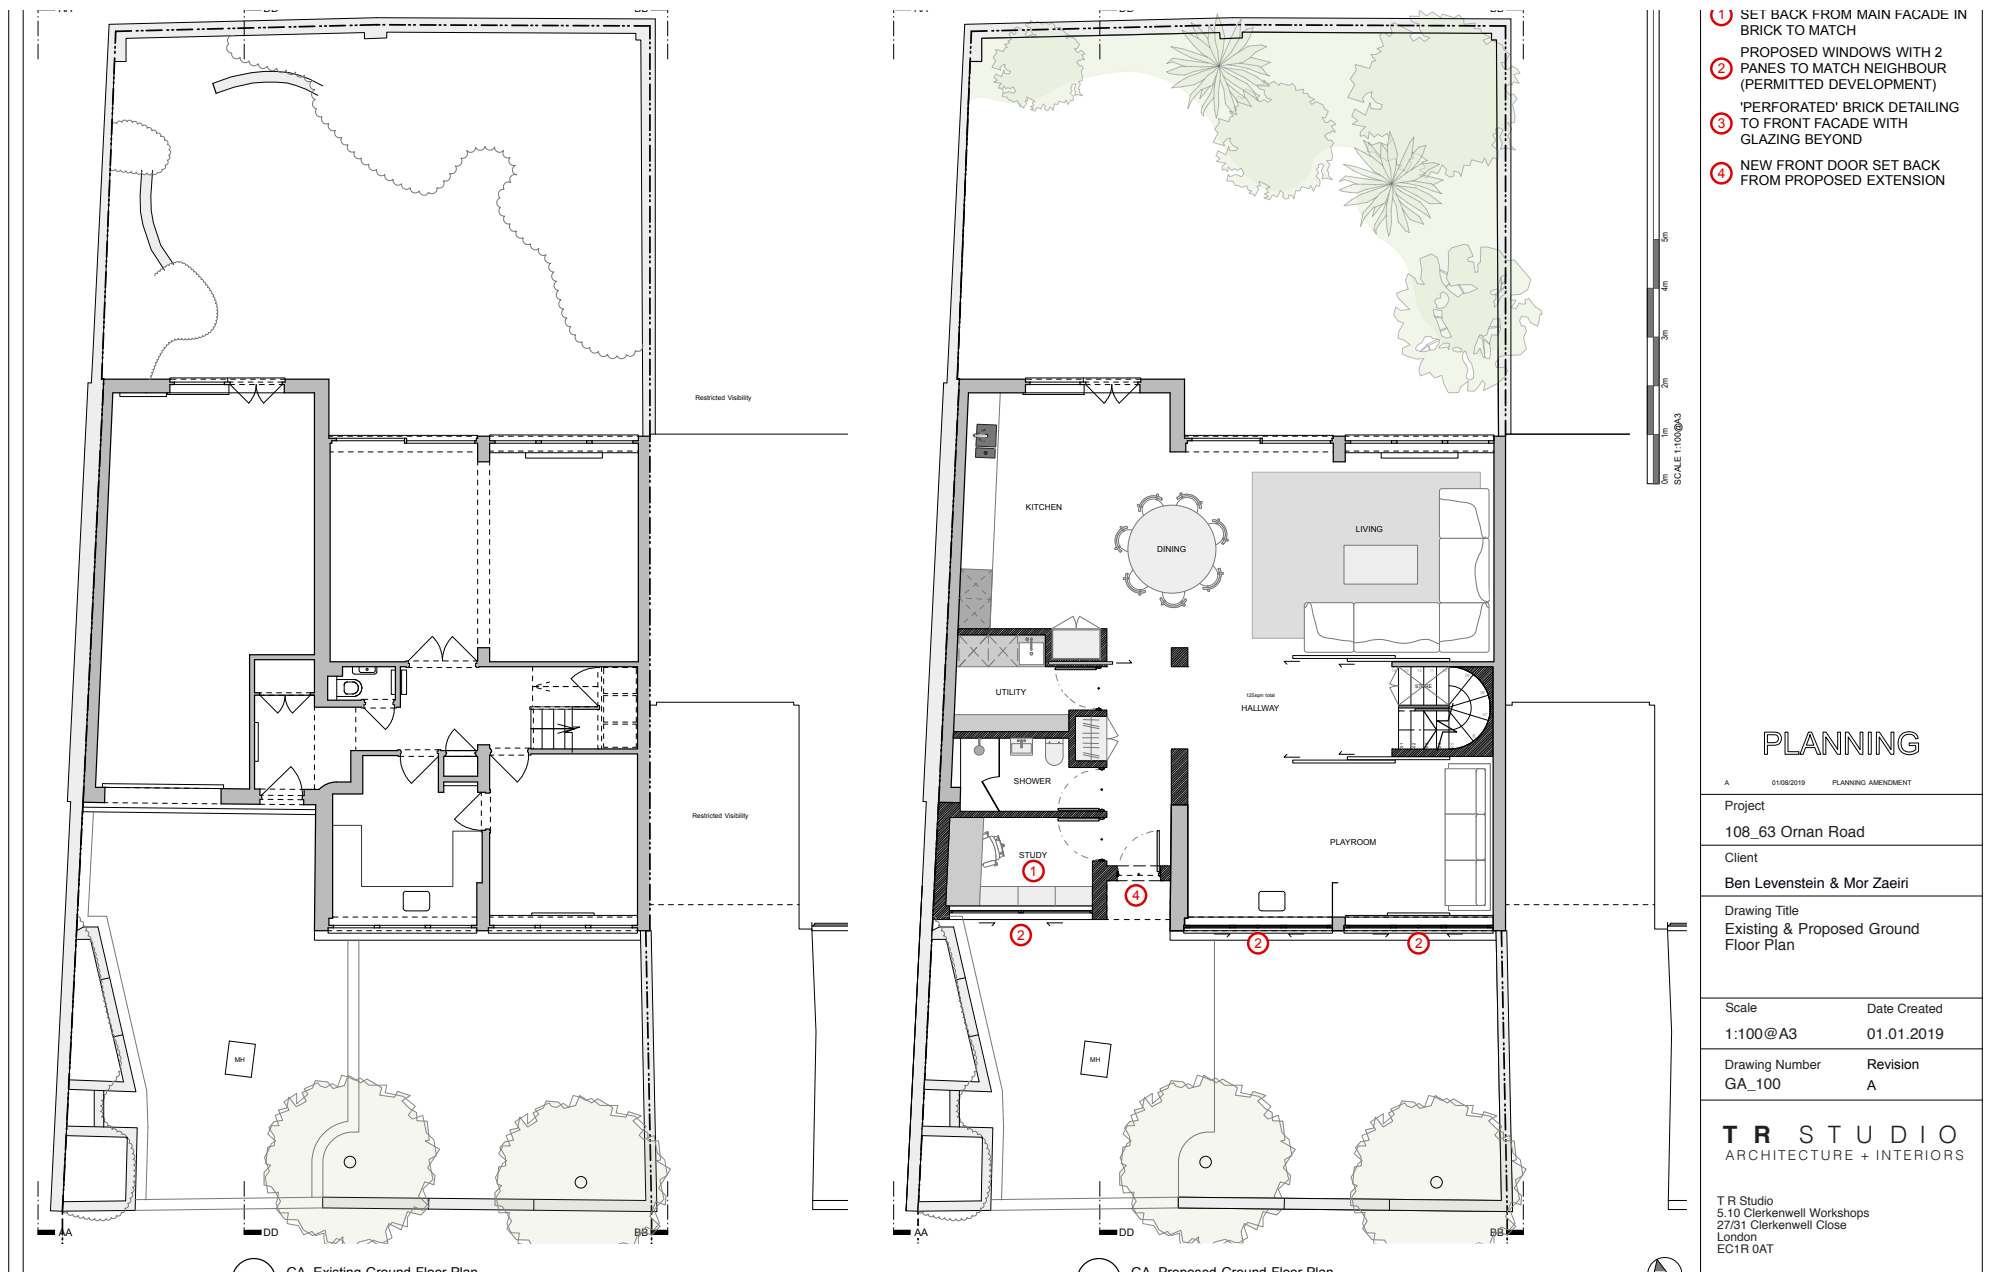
No. 63 Ornan Road existing & proposed ground floor plans.
